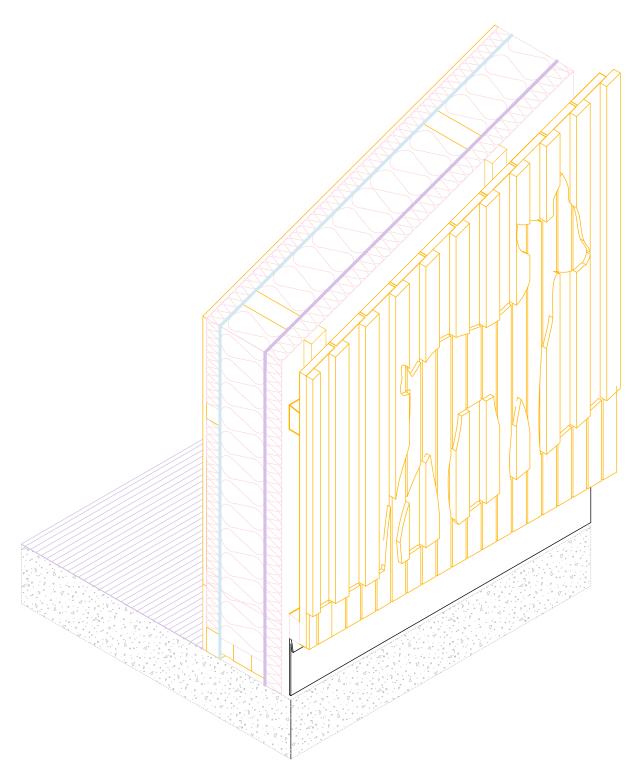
Exploded axo of construction principle over exterior wall detail pattern.
